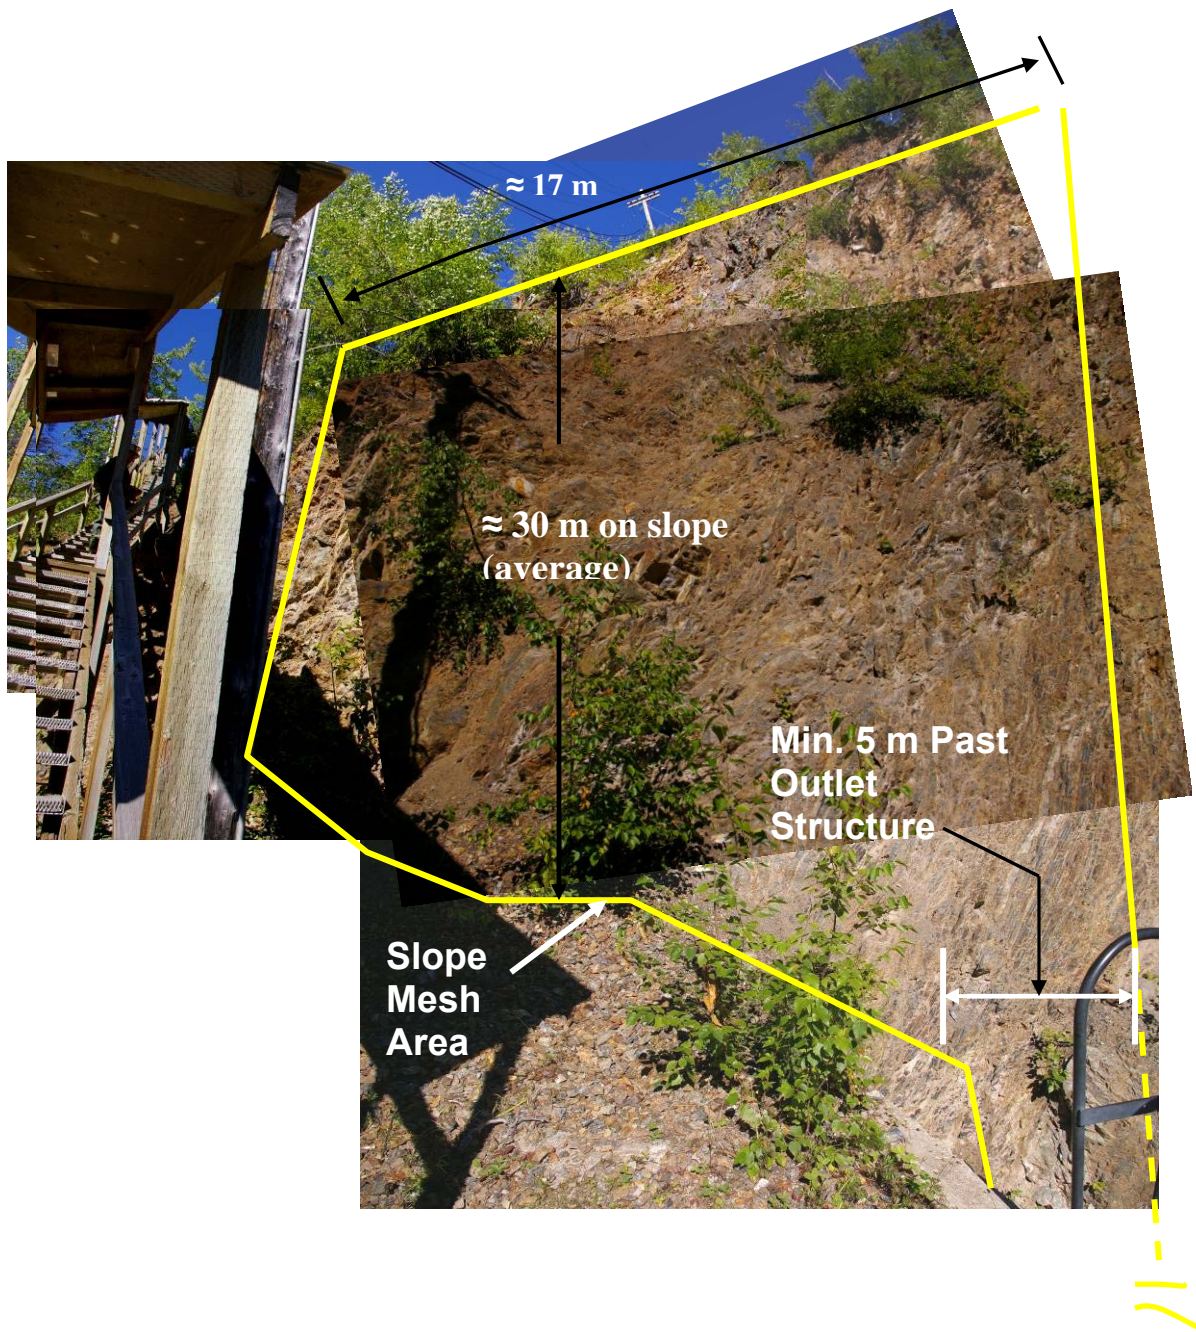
(August 15, 2007) Slope above Regulating Tunnel Outlet Structure – Scale slope above outlet structure and access stairway and install slope mesh in area approximately as shown.
